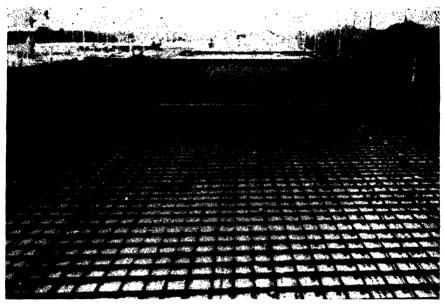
Steel pipe used both for heating and reinforcement. (Richard Crittall & Co., Ltd.)
